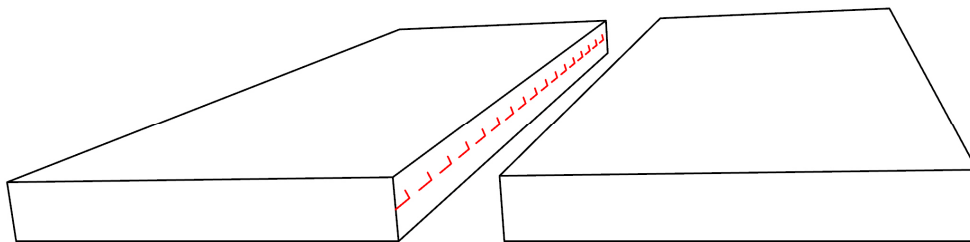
Shear force between floor elements, normally dimensioned in the design process when accounting for structural stability.
